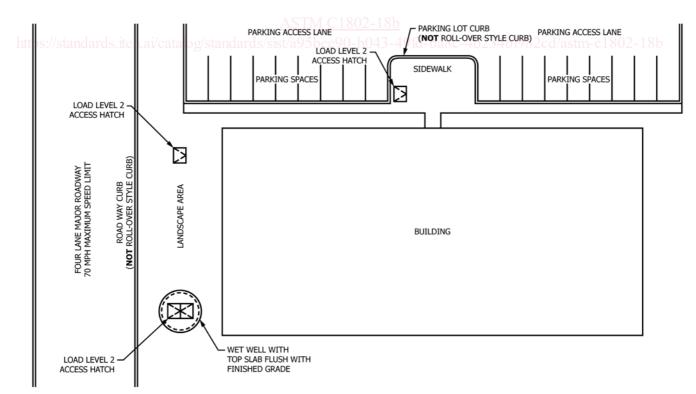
Plan Showing Appropriate Locations for Load Level 2 Access Hatches—Pedestrian Load
